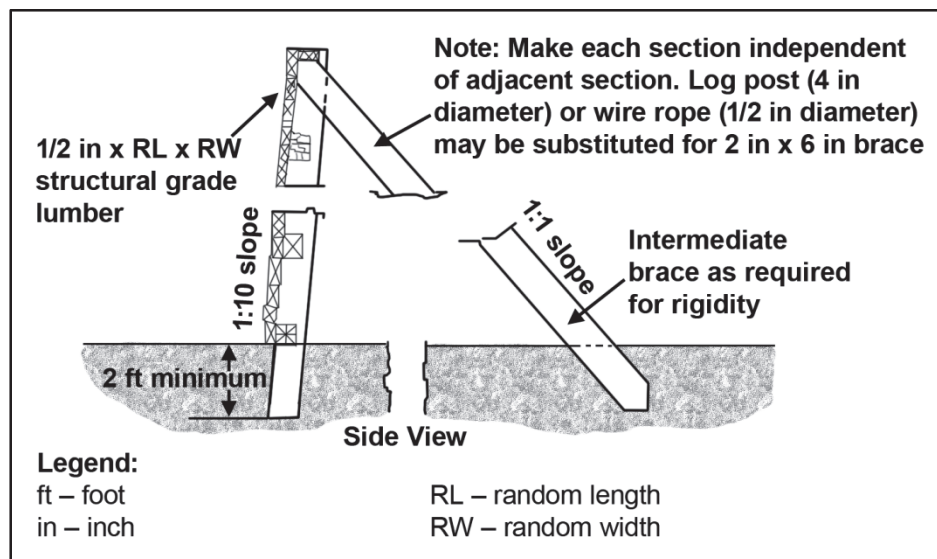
Typical standoff framing with dimensioned wood predetonation screen (side view)
